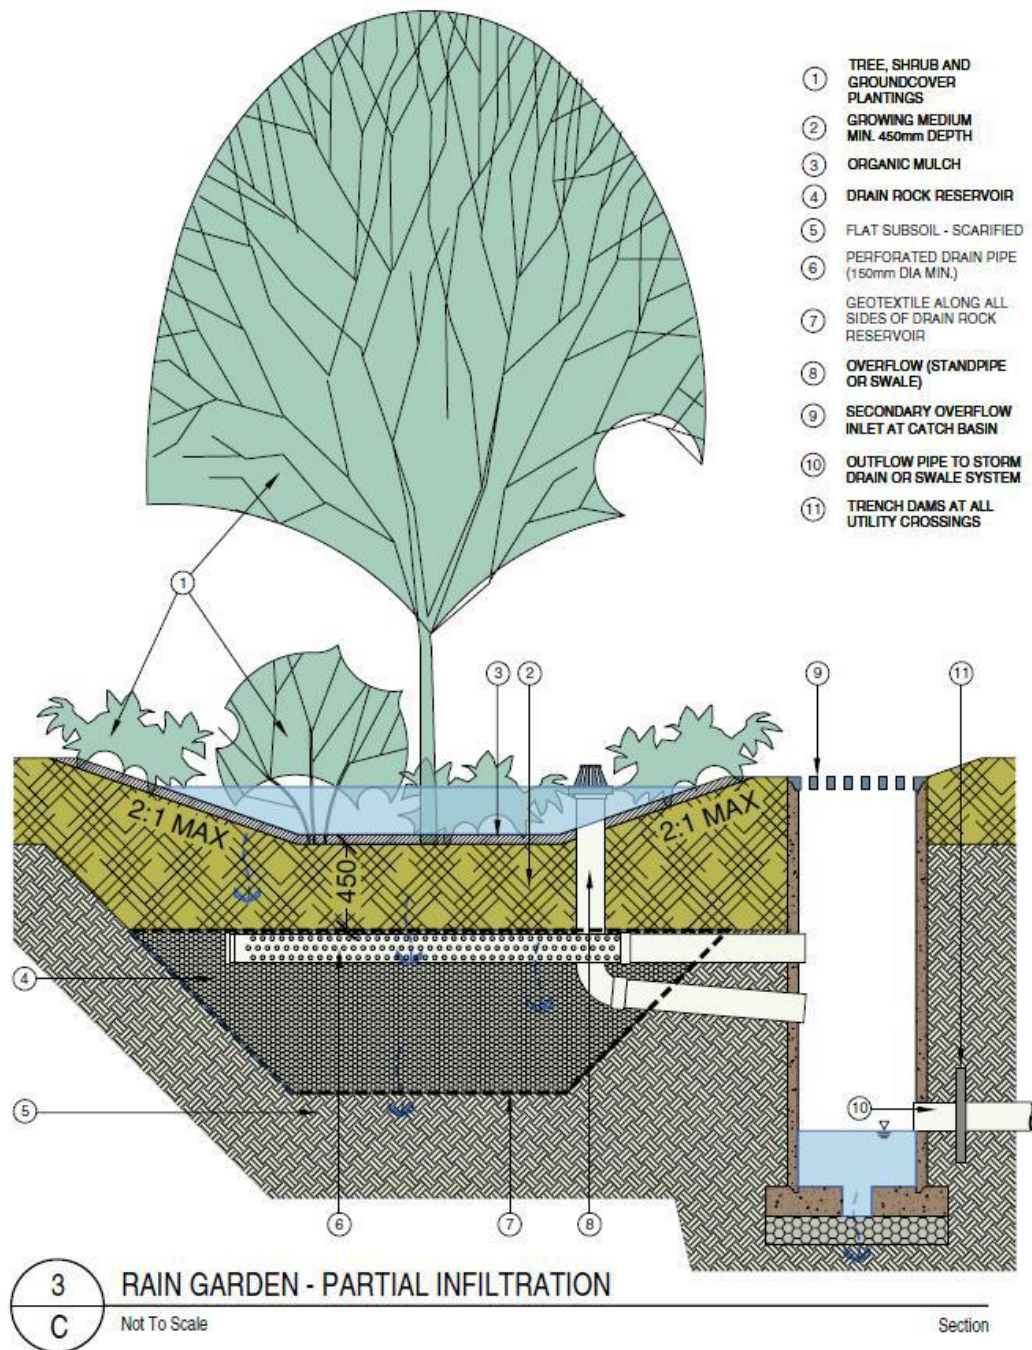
| Cross section showing the typical components of a rain garden including the soil, the drainage rockbed, and the overflow and drainage plumbing (Metro Vancouver, 2005).
